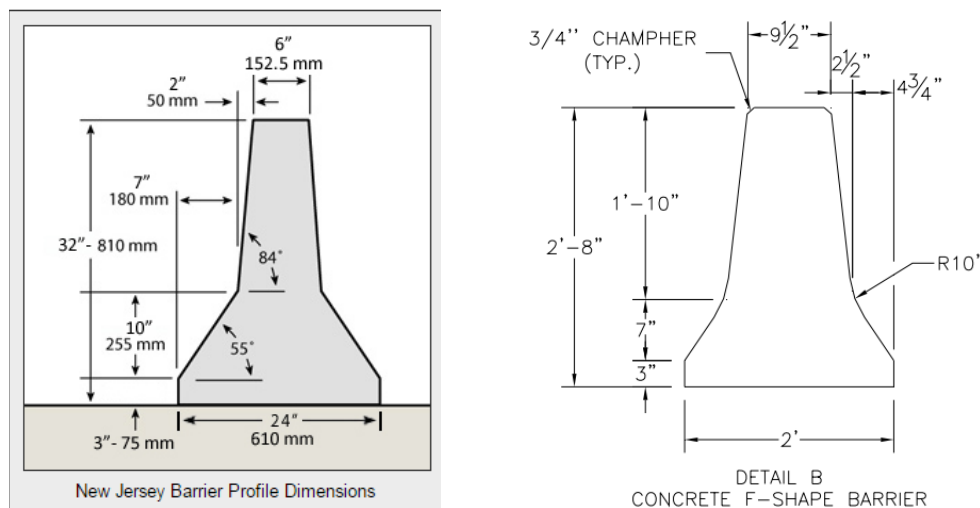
Common New Jersey Shape (Left) and F-Shape (Right) Concrete Barriers.
